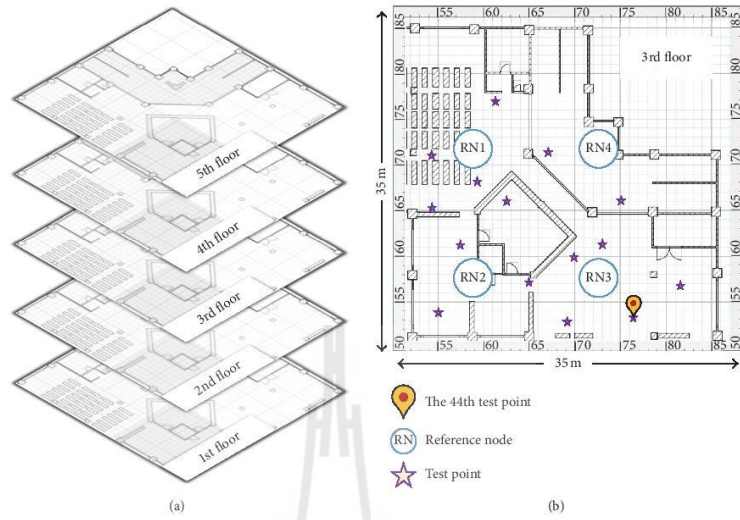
Building A. (a) The five-story structure. (b) Floor plan and example of 15 test points labelled with stars on the 3rd floor.
